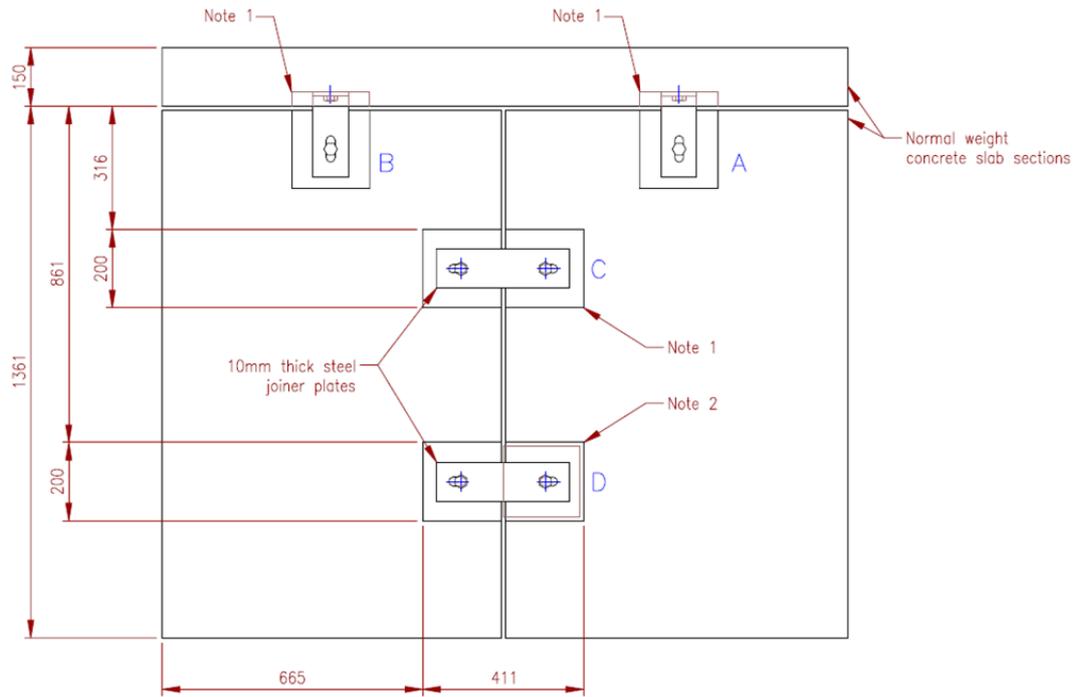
Concrete slab joint construction detail (1) as tested in WFRA 40938
